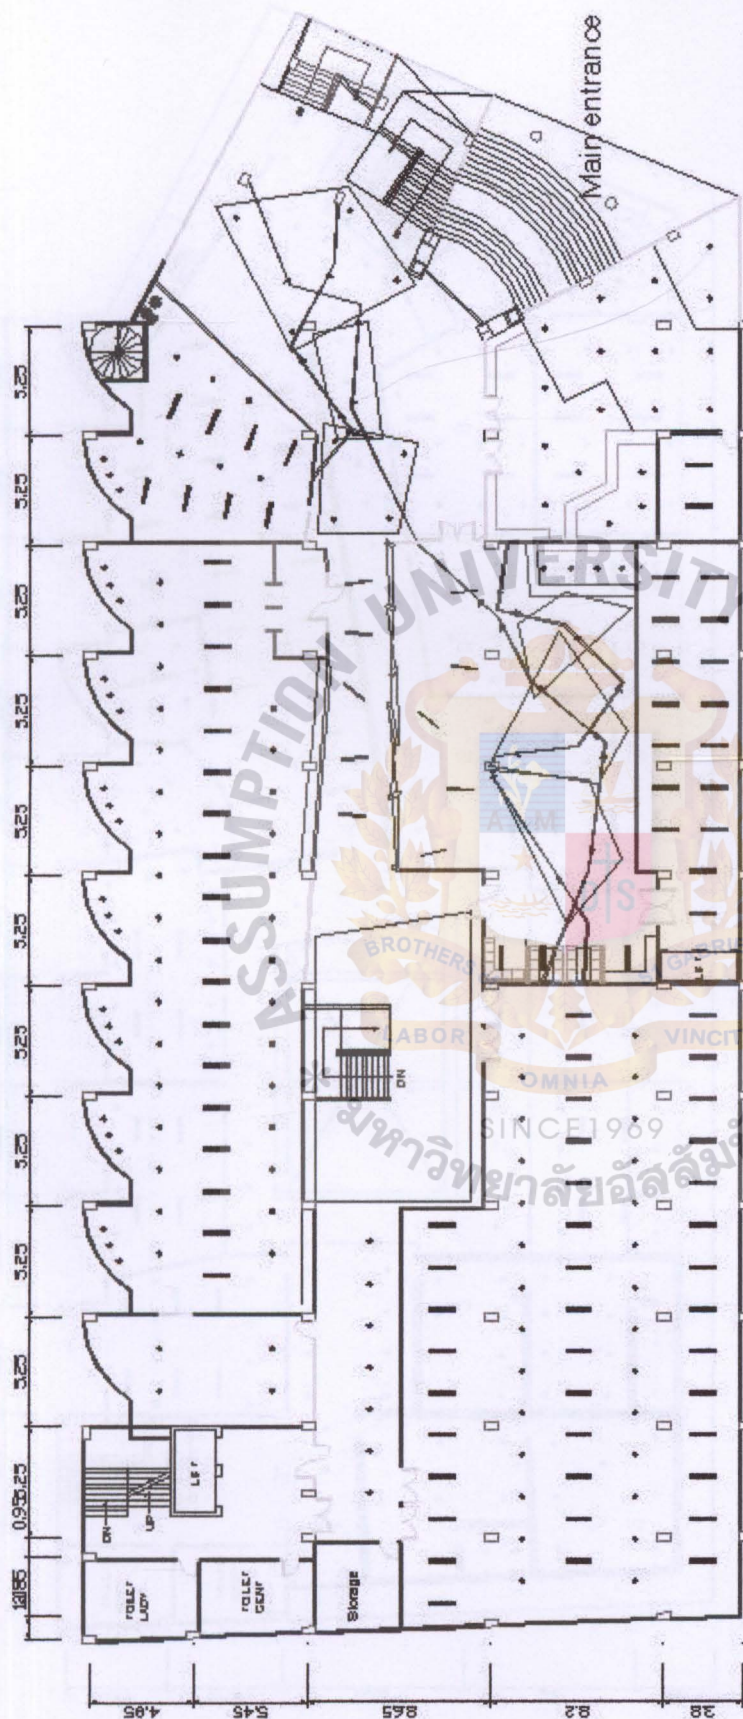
Lay-out Plan 3<sup>rd</sup> Floor
